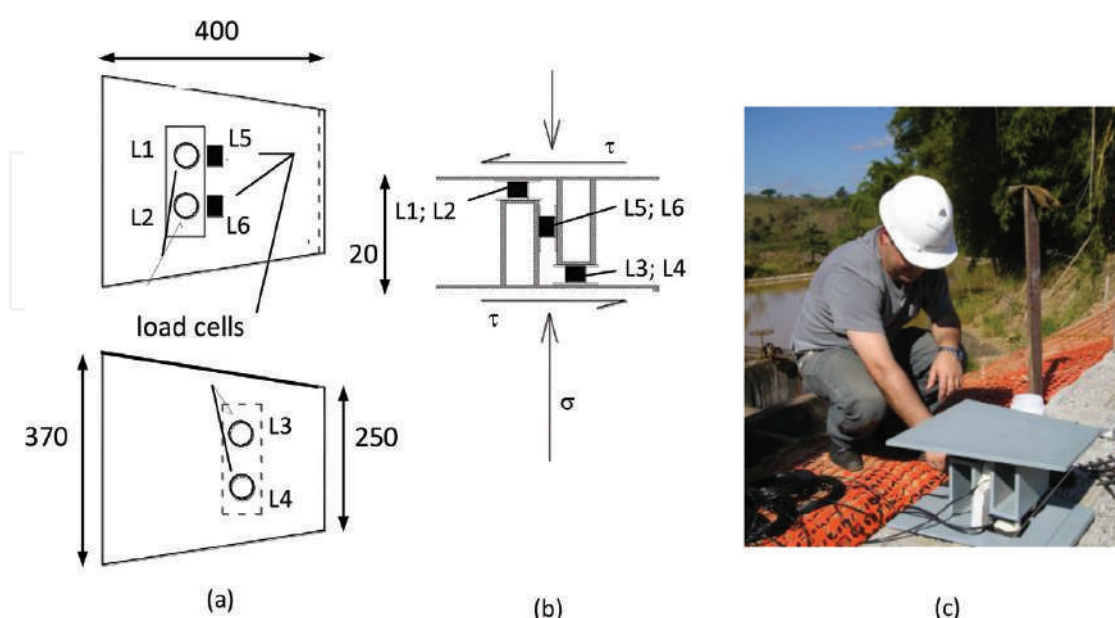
The metallic block used to measure load next to the toe of block-facing: (a) plan view, (b) section view, and (c) block positioned in the field; dimensions in millimeters [6].
